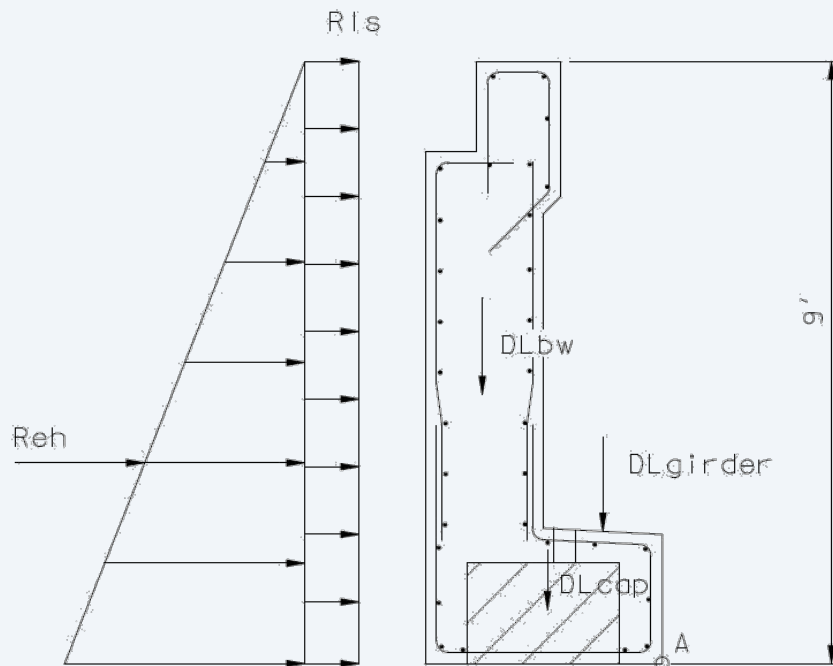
Sketch of Cantilever Abutment Cap Concept.
